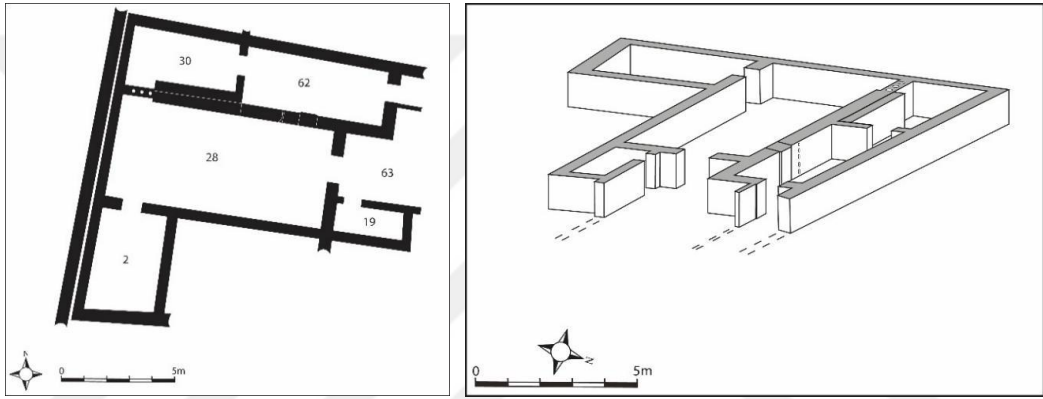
Plan of House 2 (*Illustrated by M.Çarkı*)
